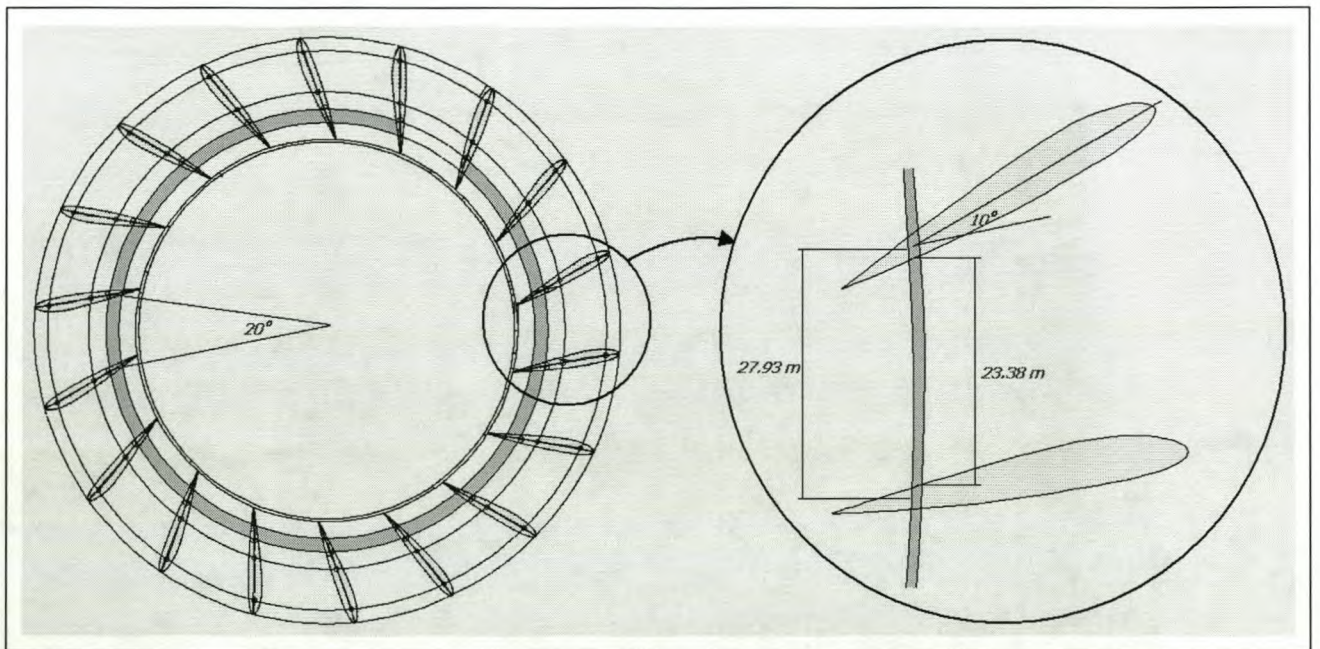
Plan view of the layout, amount, rotation and consequent dimensions of the IGV's situated below the chimney.
